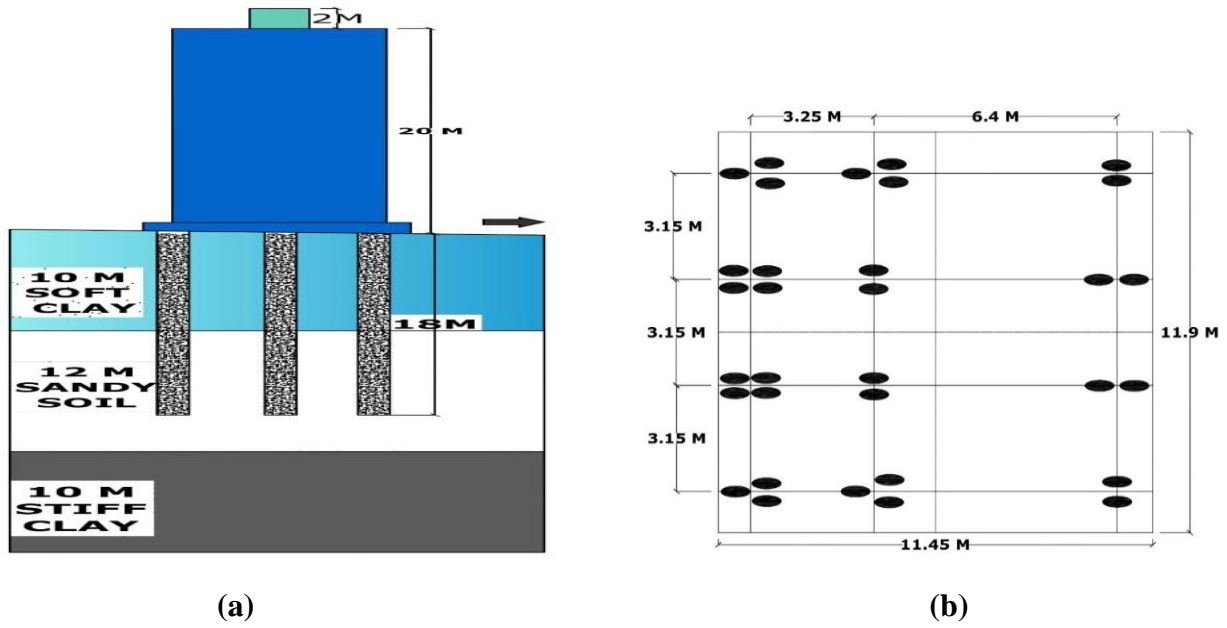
Details of a Kandla Port Building and b foundation layout plan (Dash et al. 2009)
